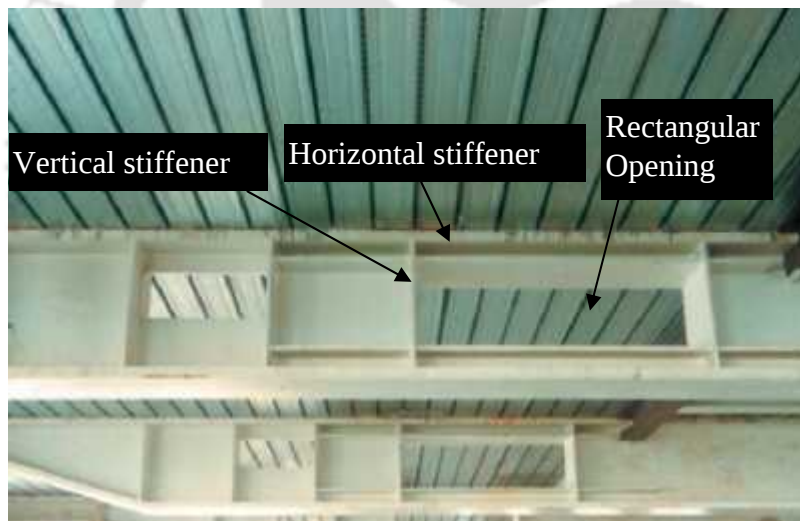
Horizontal and vertical stiffeners for rectangular opening in webs of tapered steel girder (SCI 2011)
